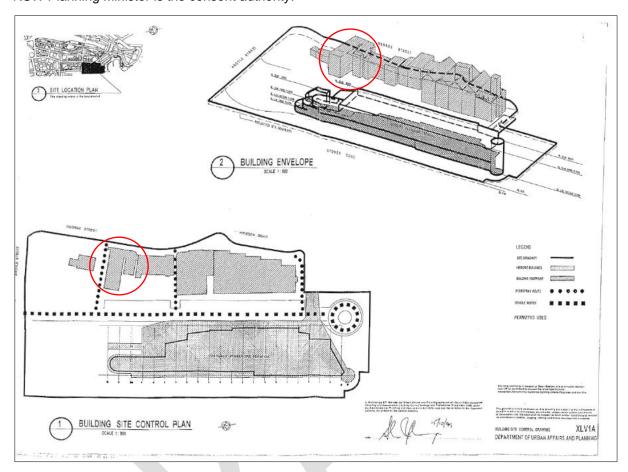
SCRA Building Site Control Drawing 'XLV1A' showing the building envelope circled in red. (Source: City of Sydney)
